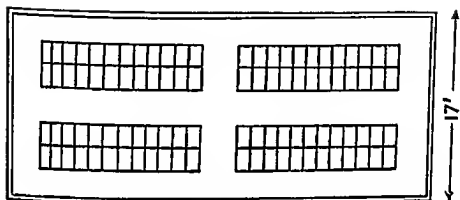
LAY-OUT OF BATTERY-HOUSE
